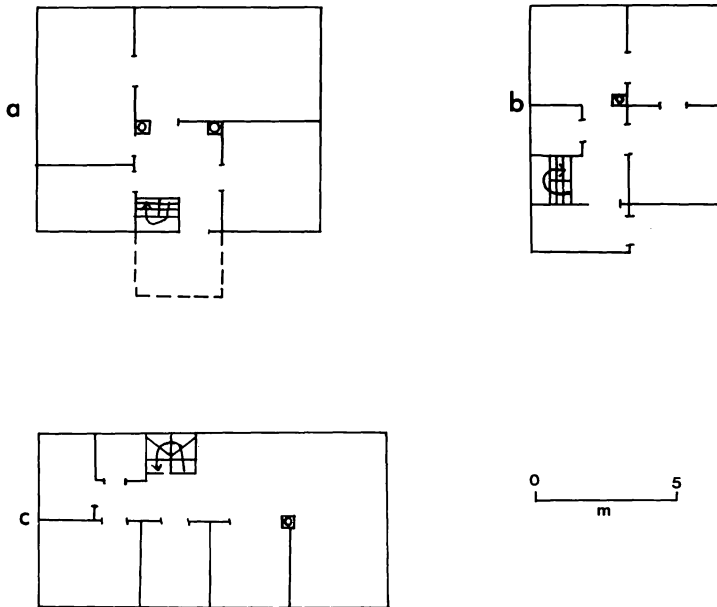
Typical ground-floor plans of 20th-century dwelling-houses in rural areas of Norway.
